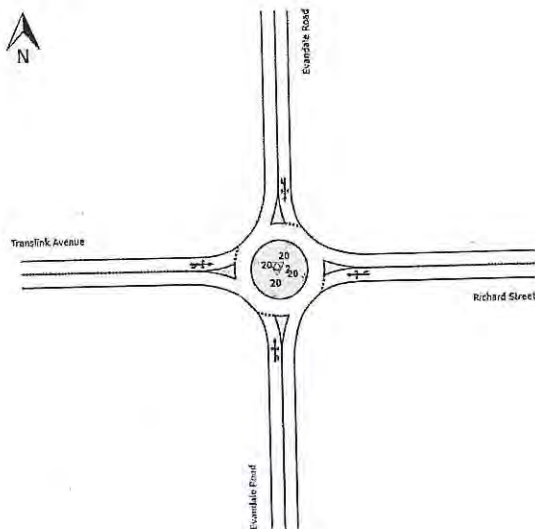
Translink Avenue/ Richard Street/ Evandale Main Road Existing Roundabout SIDRA Modelling Layout
